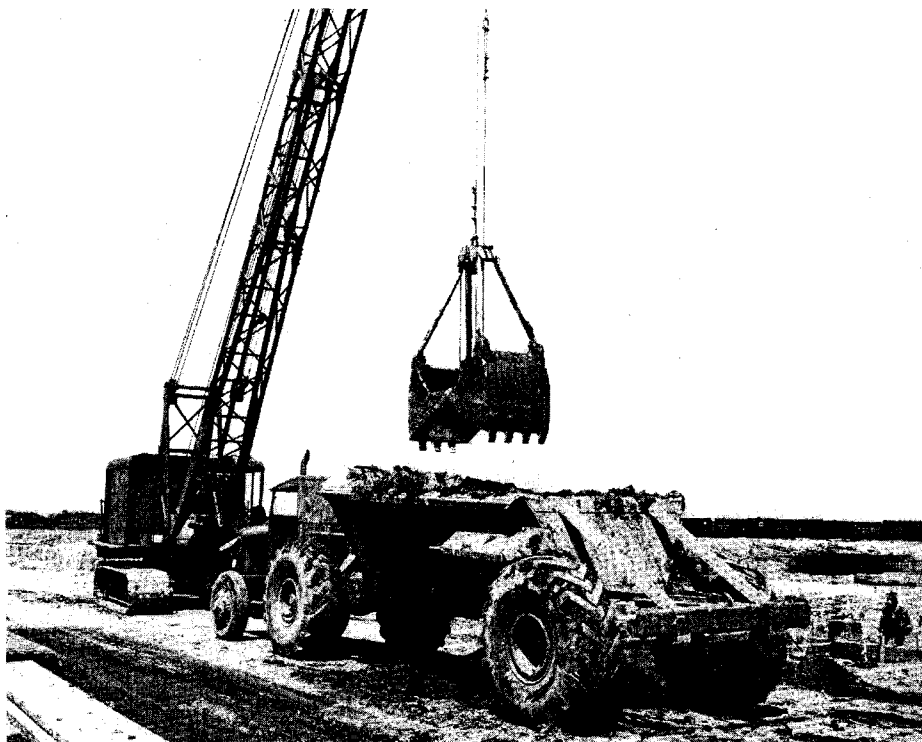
Navy Drainage Project for Elimination of Mosquito Hazard, Bousch Creek, Norfolk, Virginia. Material between sheet pile walls of canal is excavated by bucket-crane and removed by heavy duty "bottom dump." Concrete floor of canal is then poured to grade and wooden bracing removed.
